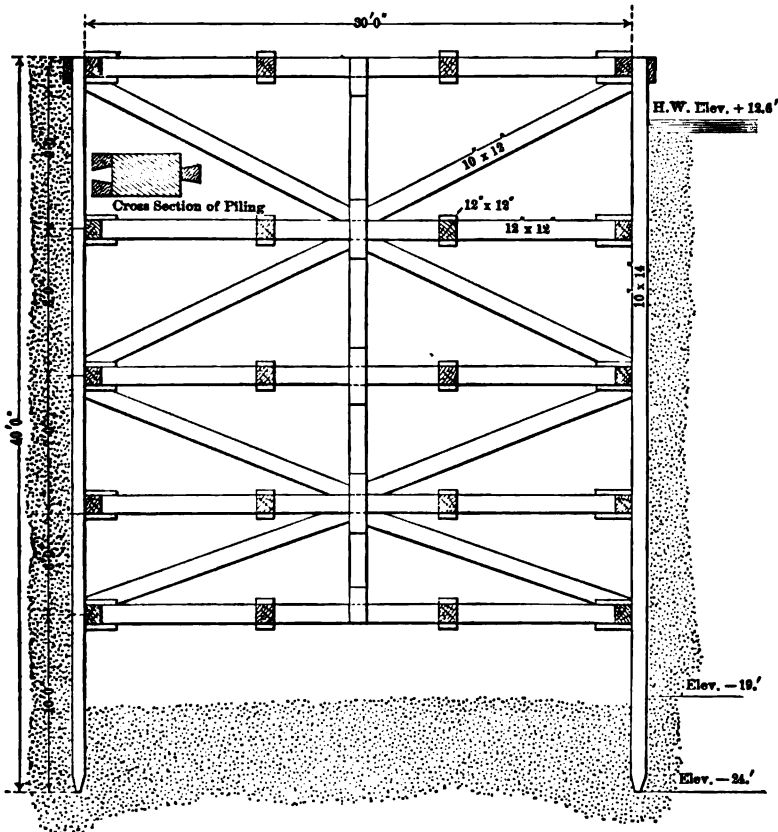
SALMON BAY COFFER-DAM PIER NO. 3.
